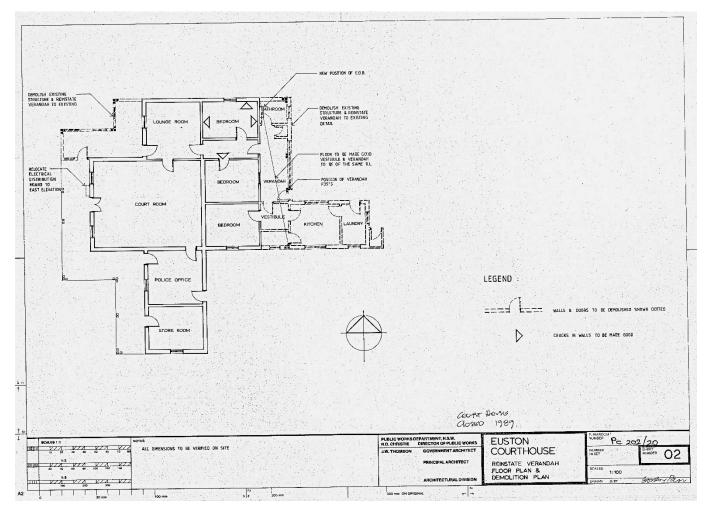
Euston Courthouse, Plan Station + Residence Demolition Plan 1989
